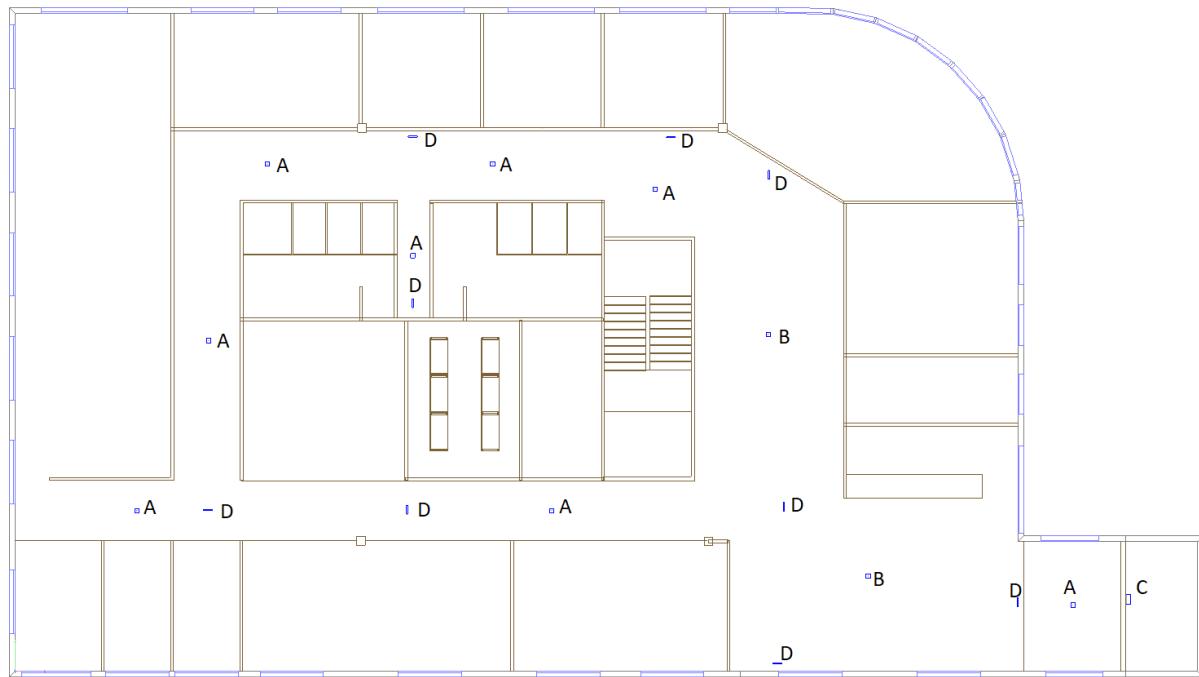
Luminaire layout for Floor 1 emergency lighting
